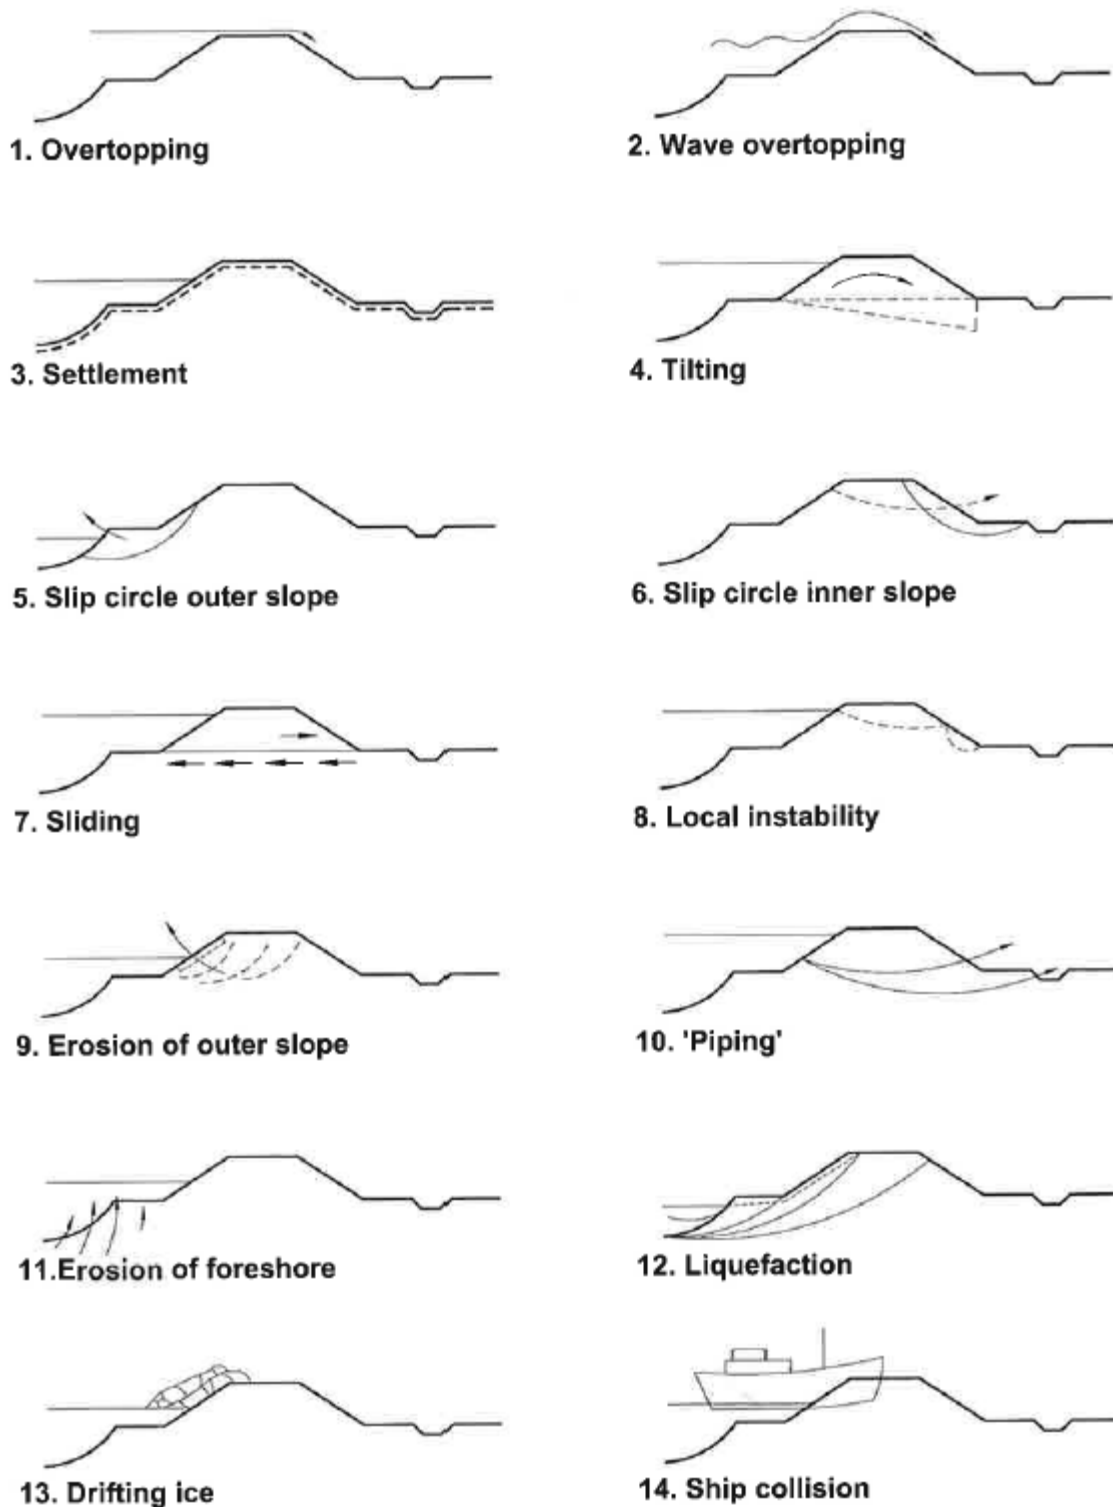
Typical failure modes for rock structures (CIRIA 2007)
